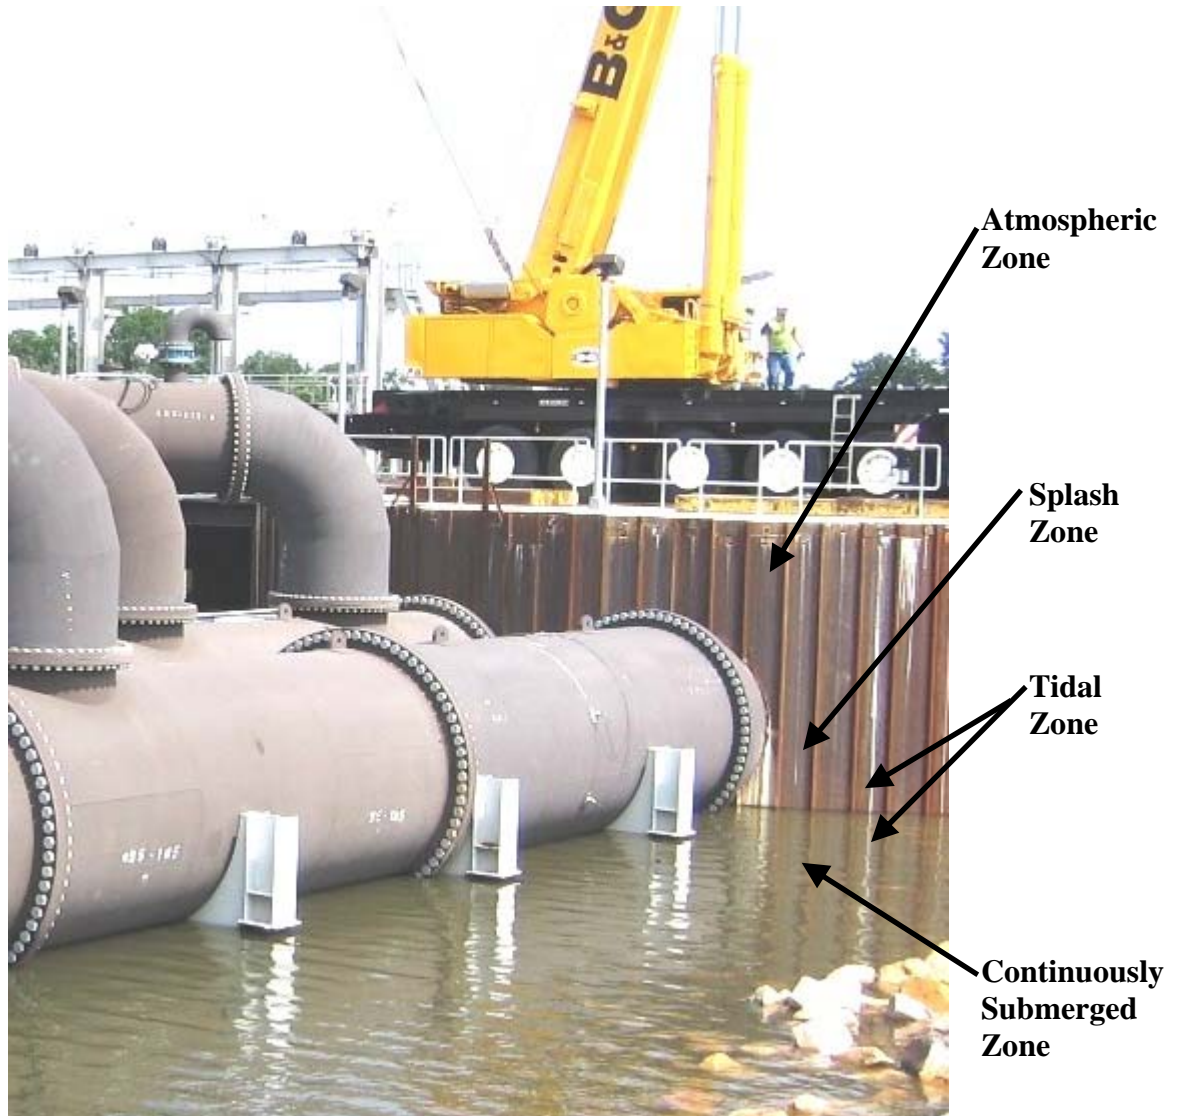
Orleans Avenue Canal Sheet Piling – Typical Splash, Tidal and Submerged Zones of Corrosion
